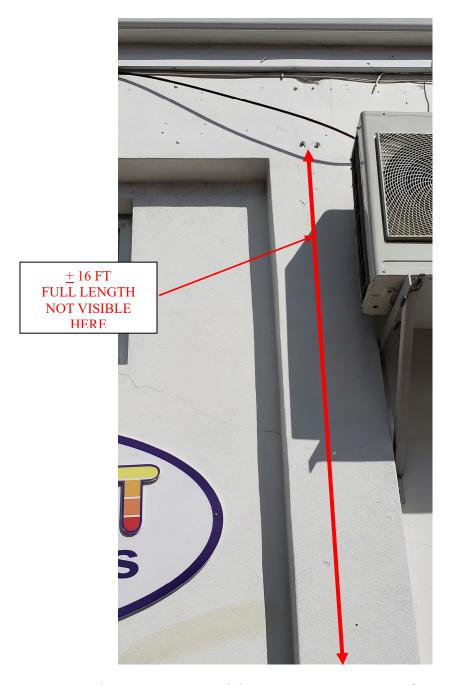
Front Elevation near roundabout. Location 2: Approximately 16 ft long new 16x16 concrete column. See detail 1/S101.
